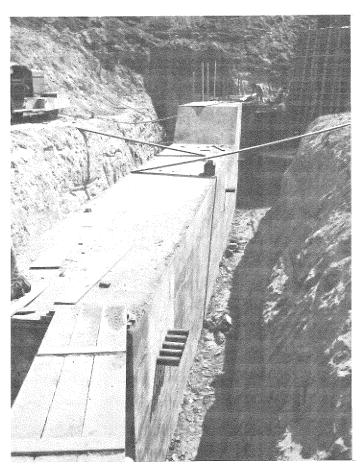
Drainage inspection chamber. Note pipes for drain lines.
